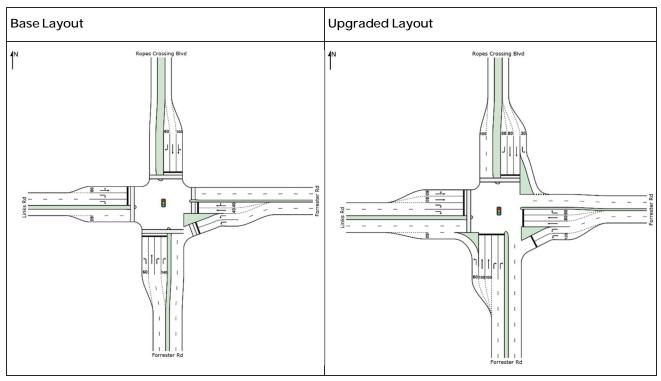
2031 with Links Road extension - Forrester Road/Ropes Crossing Boulevard/Links Road
